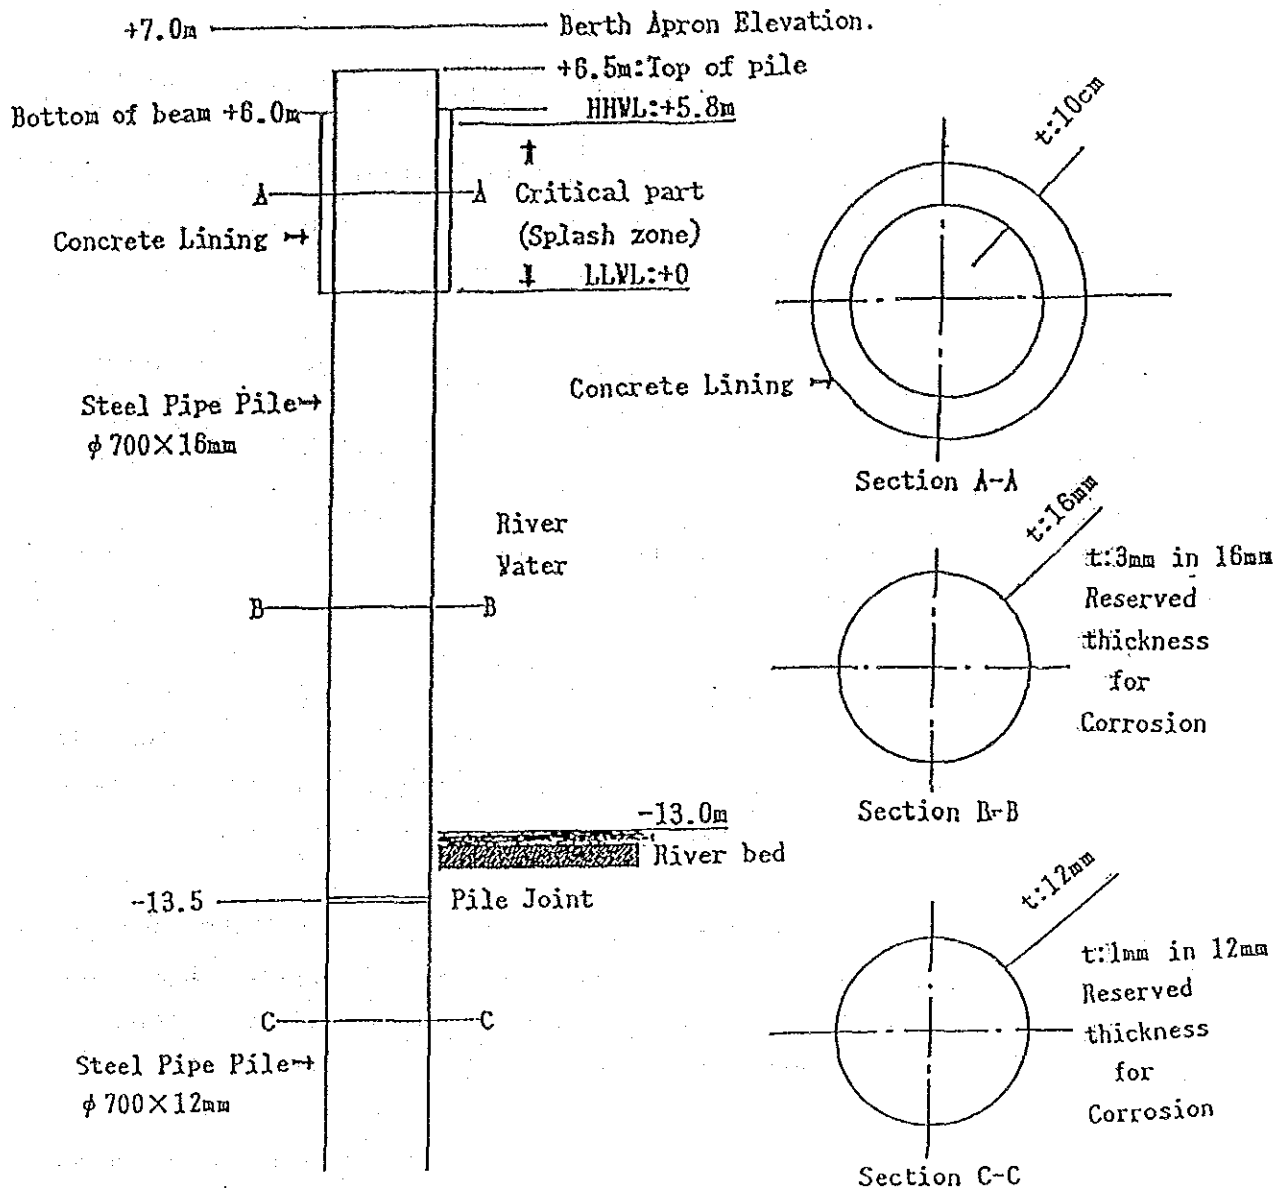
Concrete Lining of Steel Pipe Pile
